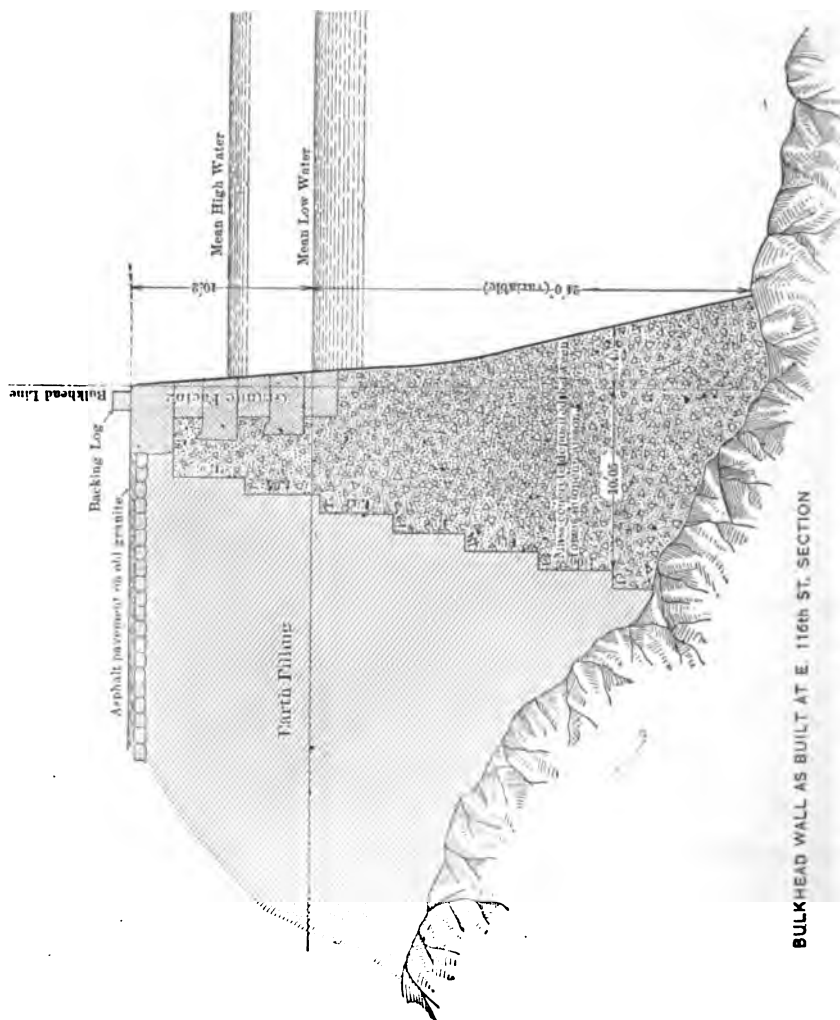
NEW YORK SEAWALL ON ROCK.
